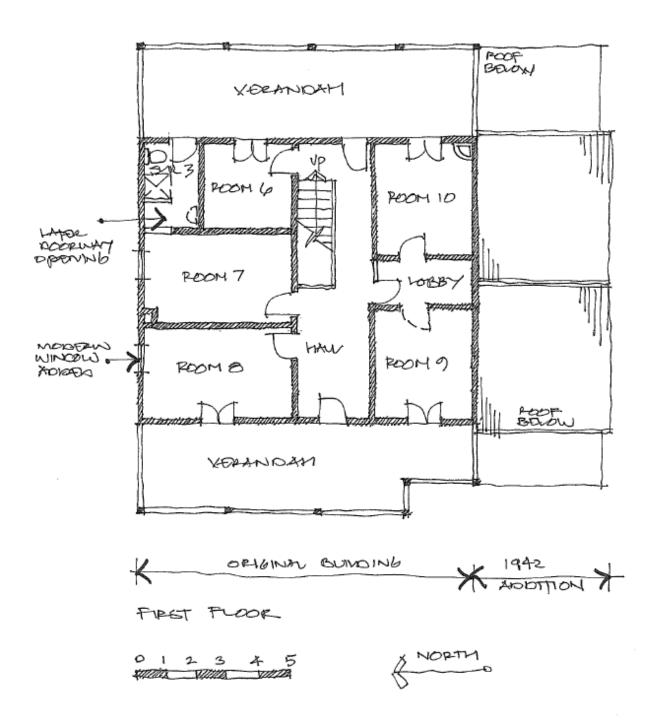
Sketch plan of Building CM3. (Source: David Hobbes of Philip Leeson Architects, May 2014)
